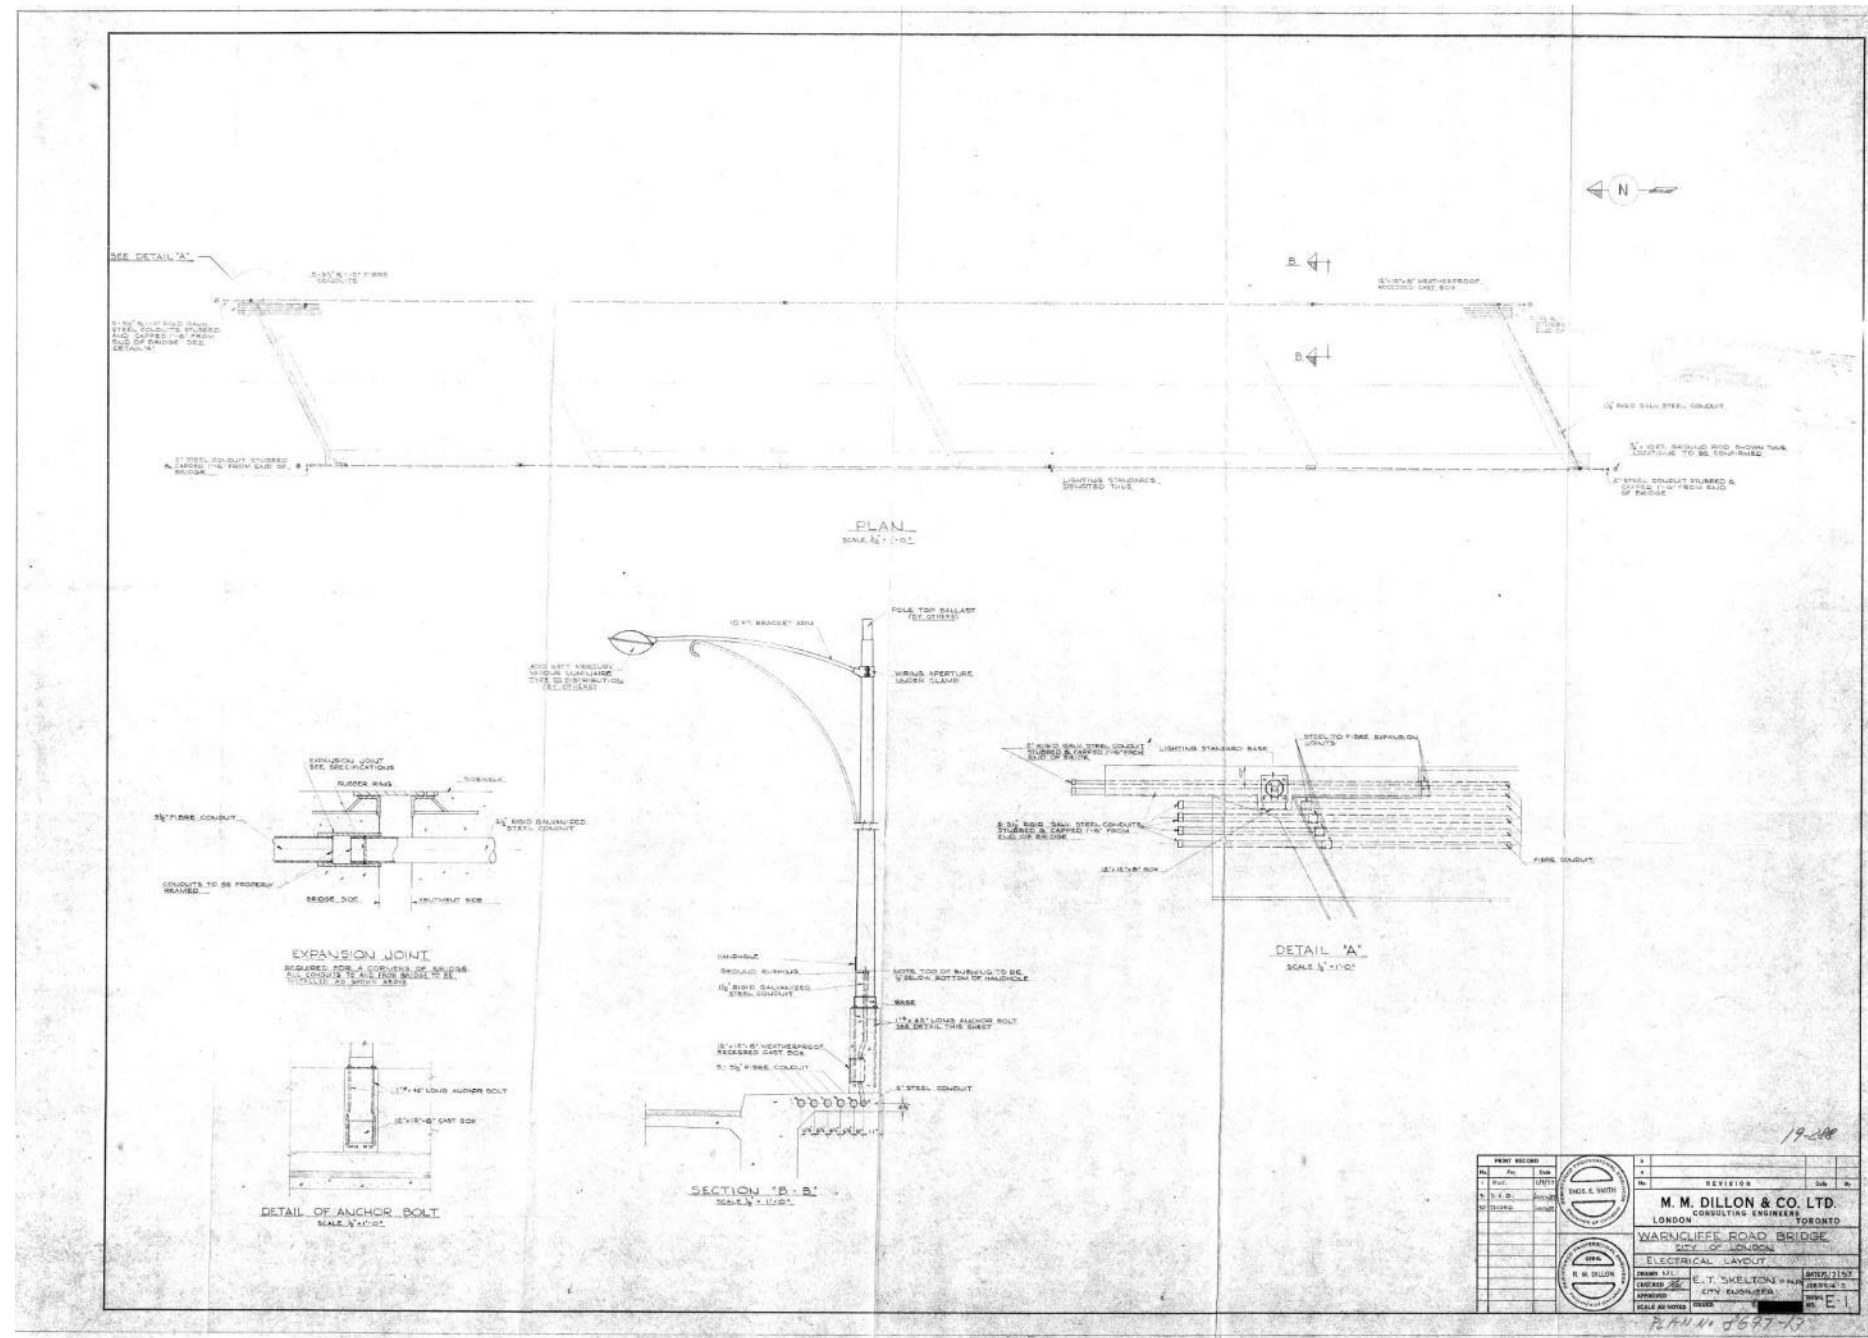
Light Standard Details of Wharncliffe Road Bridge, 1957
